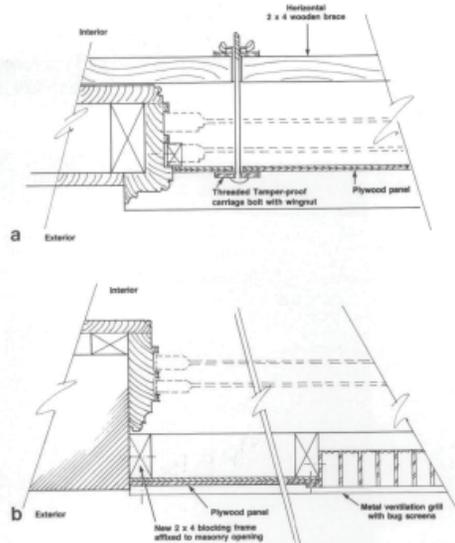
A: Plan detail showing plywood security panel anchored with carriage bolts through to the inside horizontal bracing, or strong backs. B: Plan detail showing section of plywood window panel attached to a new pressure treated wood frame set within the masonry opening. Ventilation should be included whenever possible or necessary.
